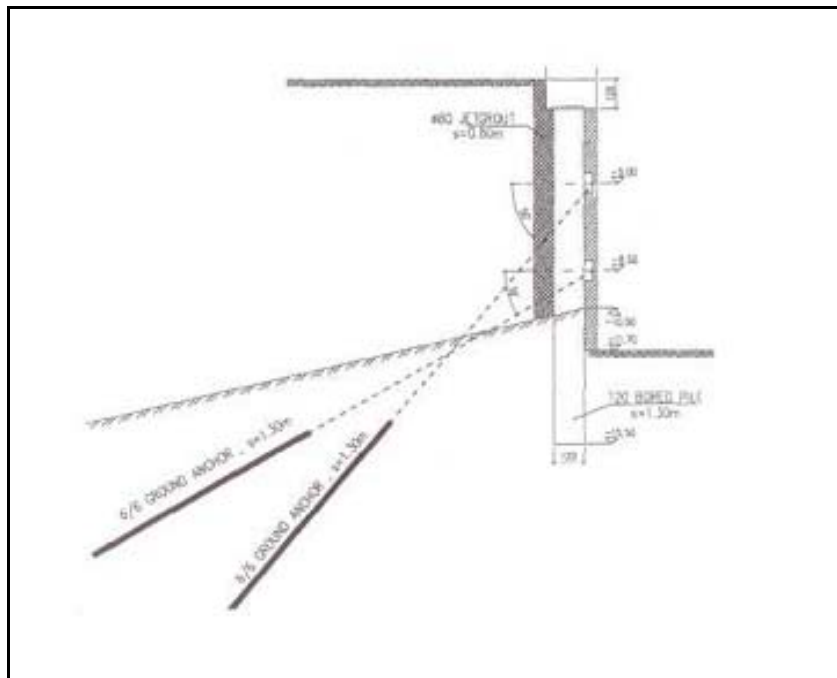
An application of a tied back cast in-situ bored pile with jet grout columns behind for a hotel building in Istanbul (Saglamer *et al.*, 2007)
